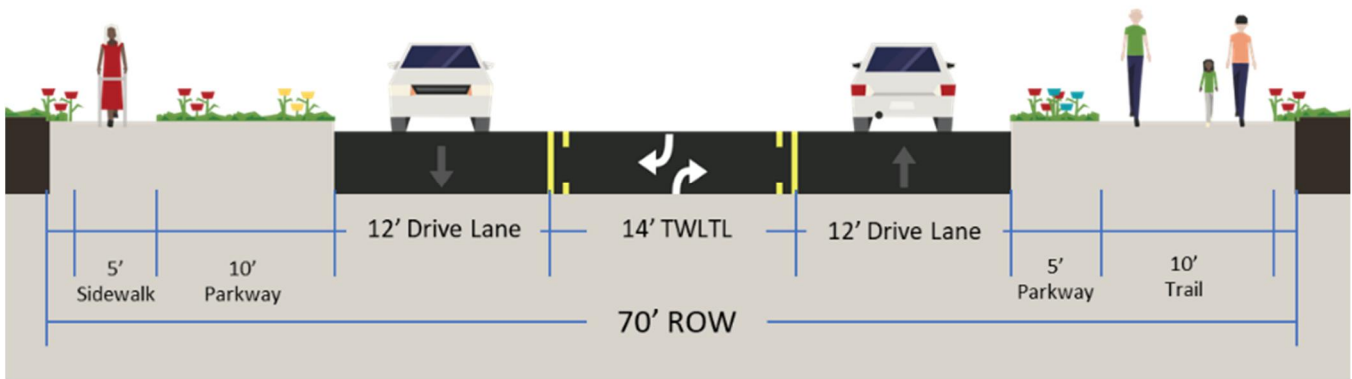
Proposed Cross Section: 3-Lane Undivided Collector – Sidewalk vs. Trail Option
